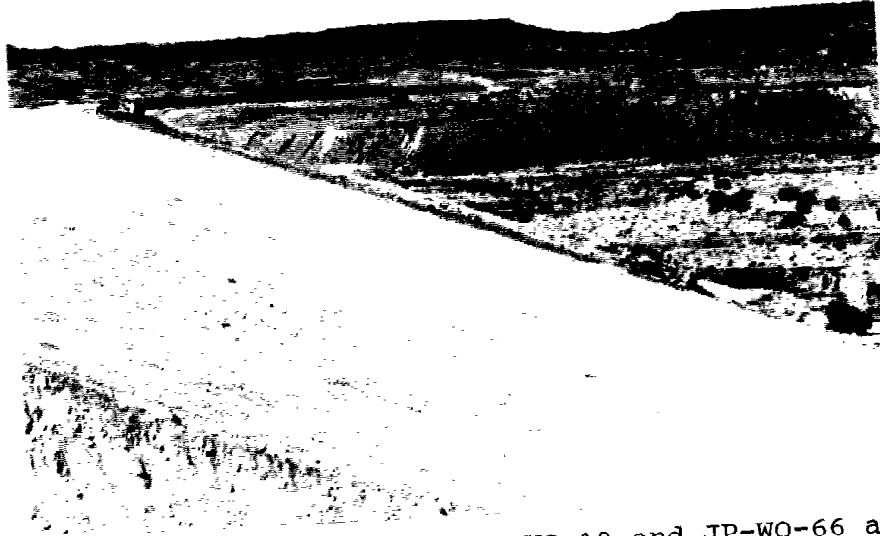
Dozers sloping in JP-WO-18 and JP-WO-66 areas (northwest Jackpile, looking SW).
